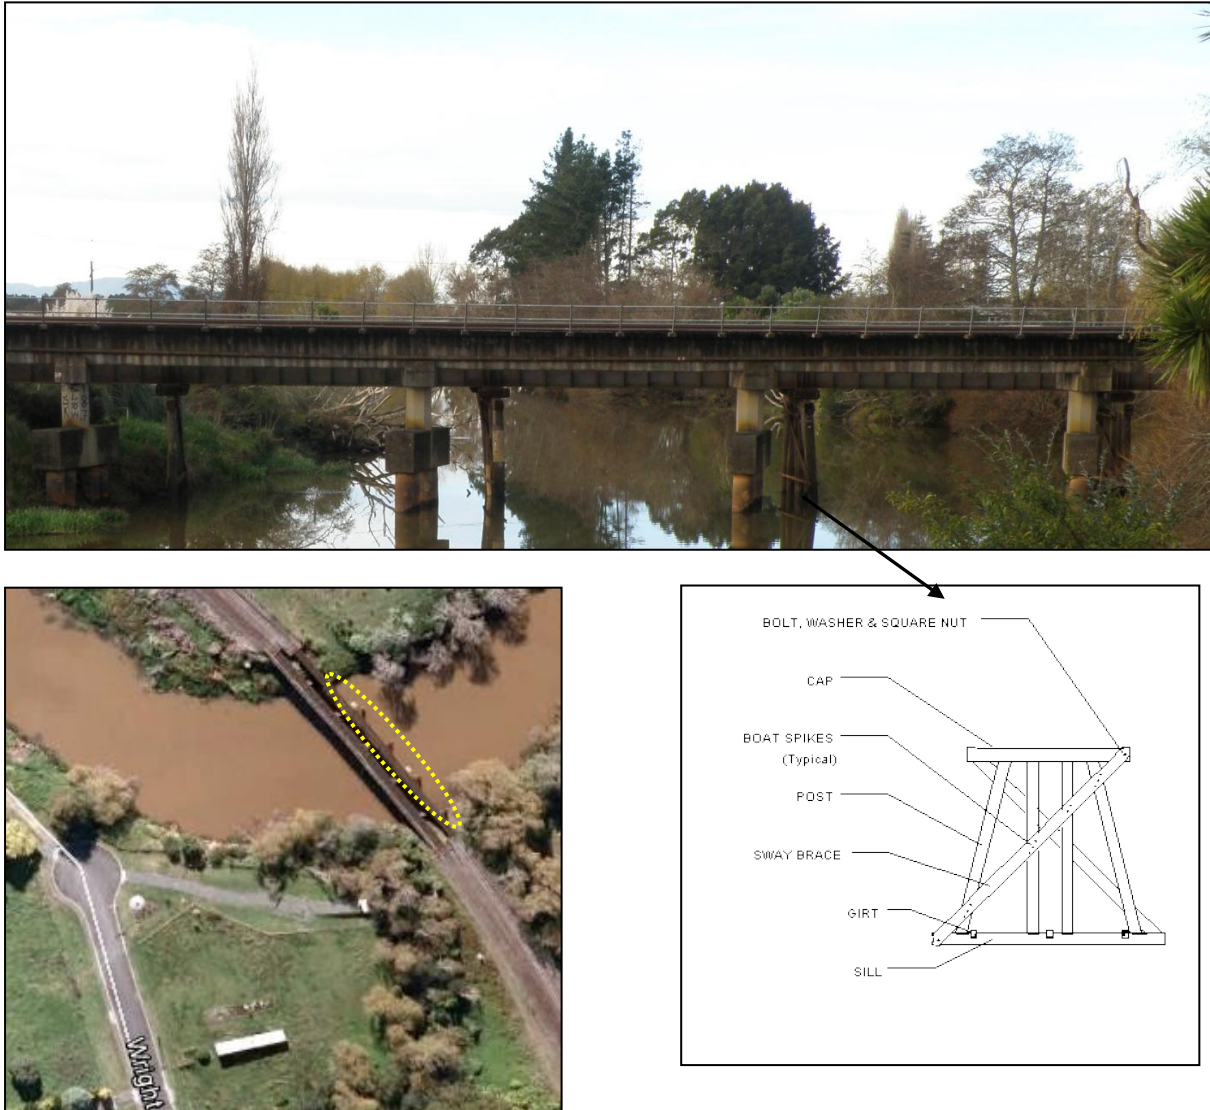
Remains of the former trestle bridge parallel to the new rail bridge.
